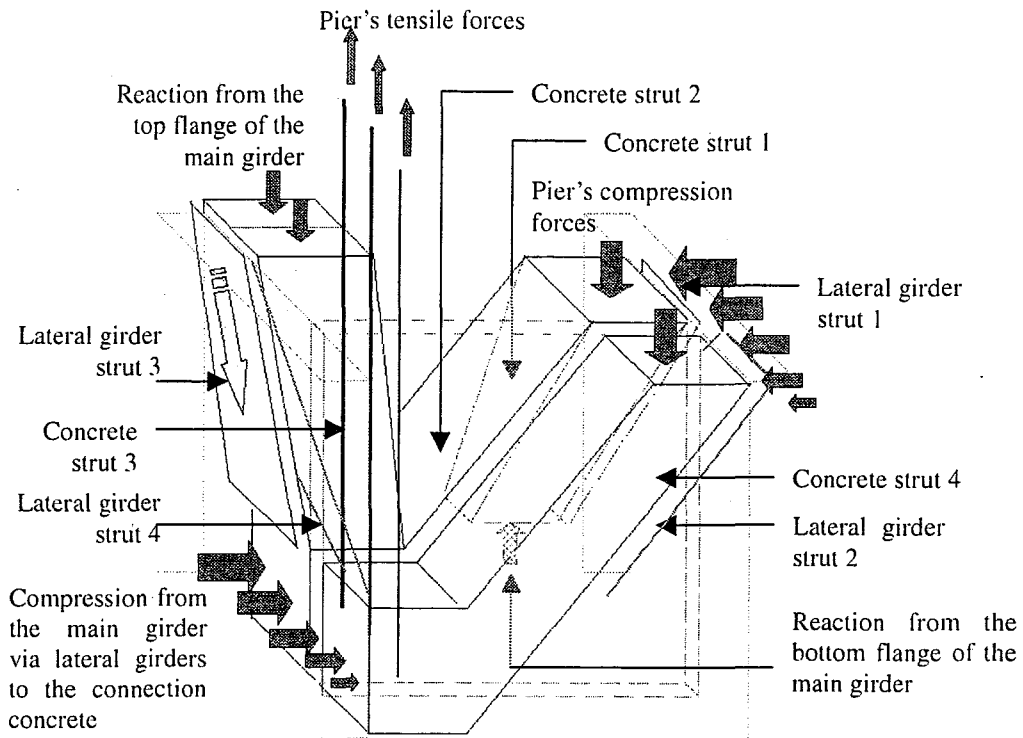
(a) Force transfer mechanisms inside the connection concrete of specimen C-3.
